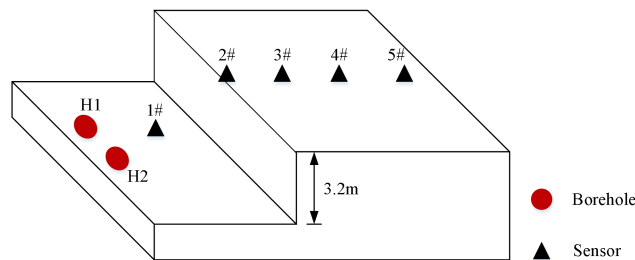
Schematic diagram of on-site borehole and vibration sensor layout
